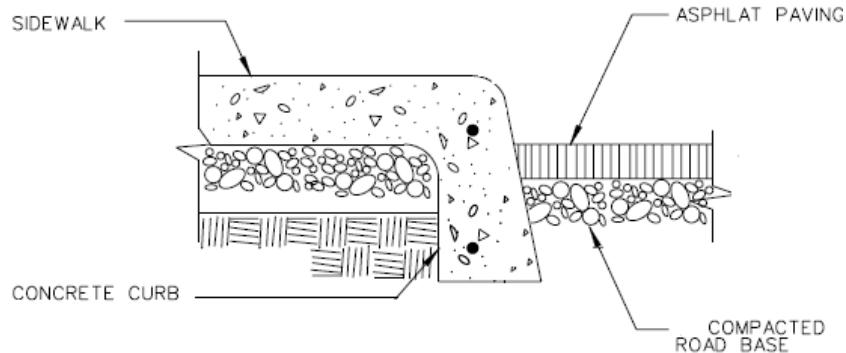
Typical Cross Section of a "True" Integral Sidewalk/Curb & Gutter (www.facilities.utah.edu/cdc)
